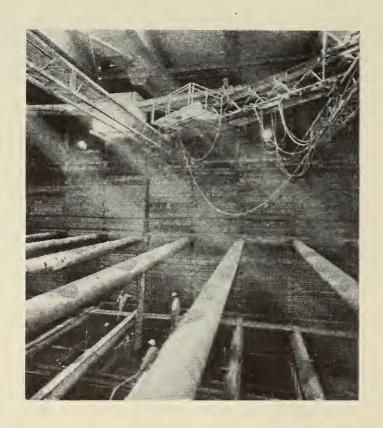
BART, SAN FRANCISCO, Gantry Rig with Pivoting Conveyor Truss Placing Concrete. (From <u>Engineering News-Record</u>, July 24, 1969, p. 30, by permission.)
